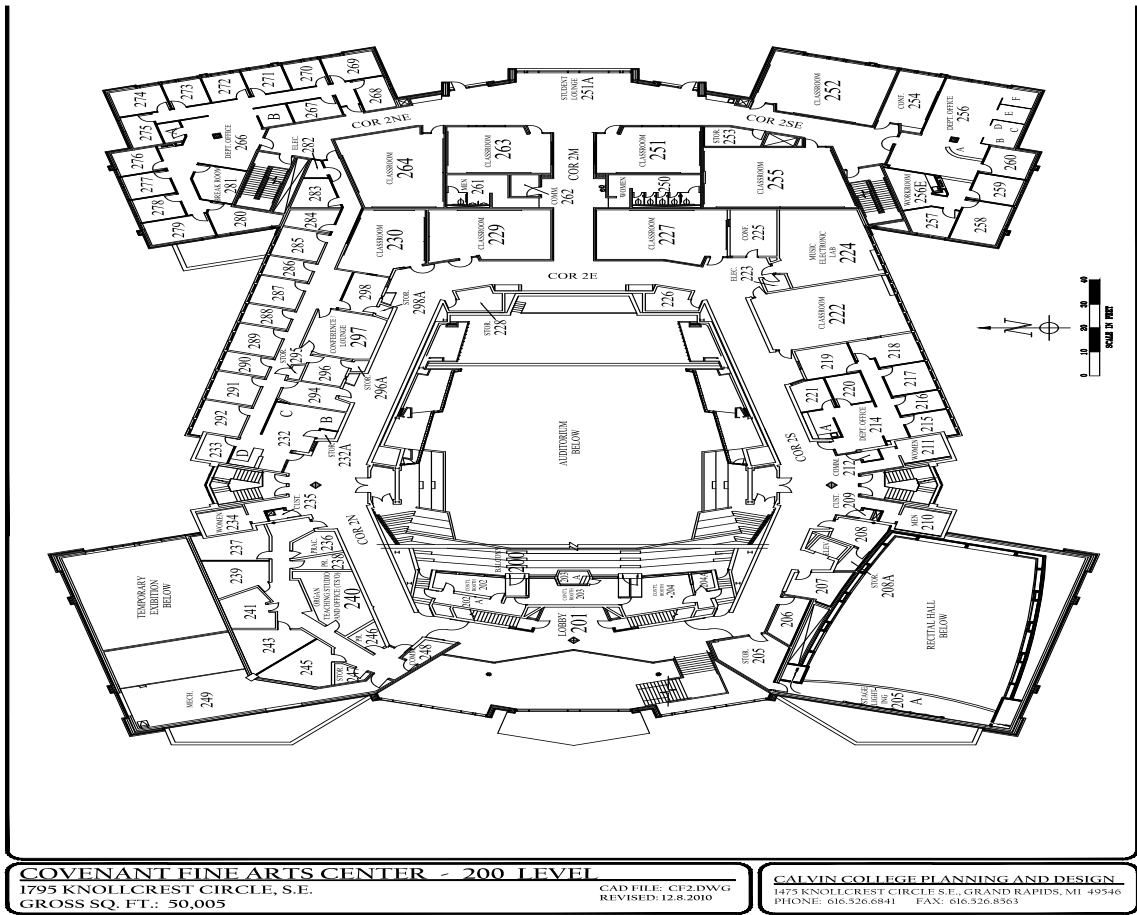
CFAC Upper-Level Floor Plan Roofs 1, 2,3.
